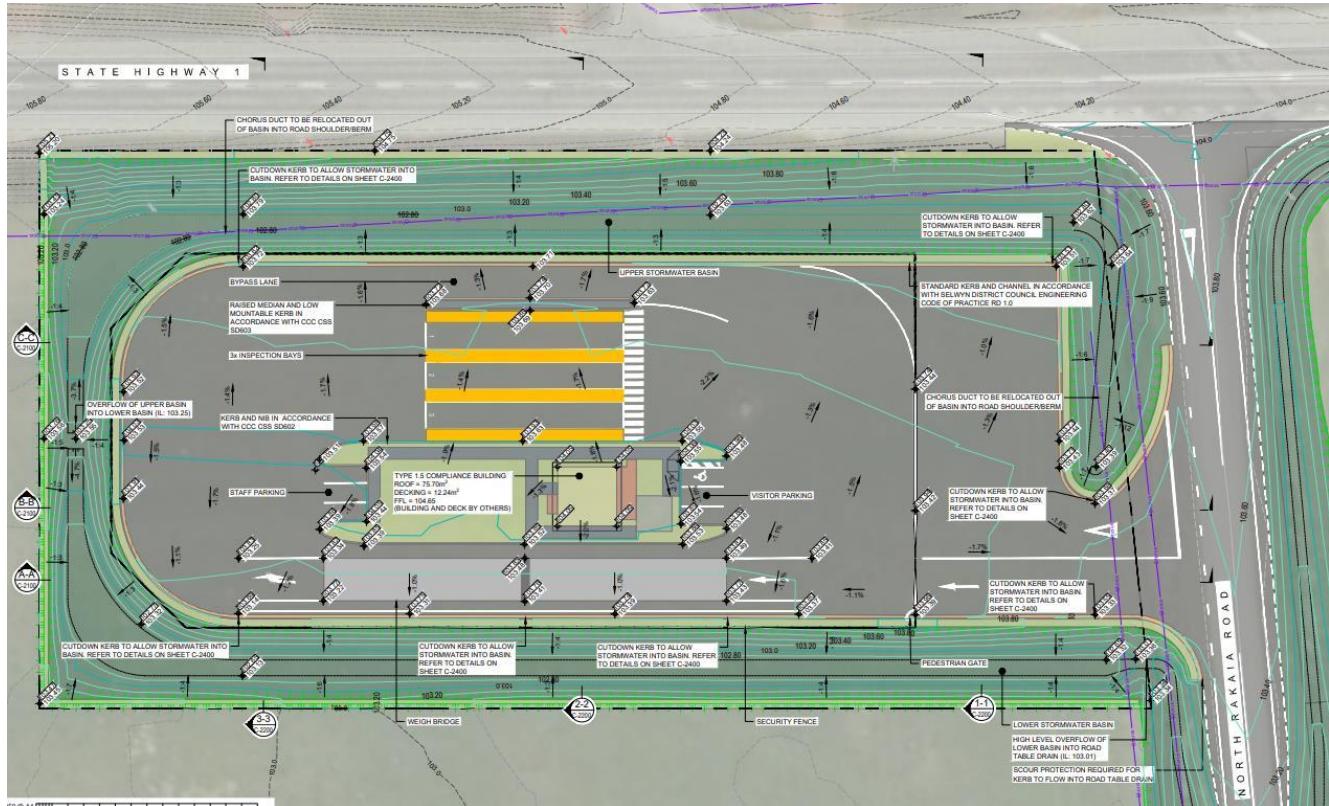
Proposed general layout of the CVSC to be located in Designation TR7. (Source: WSP)
